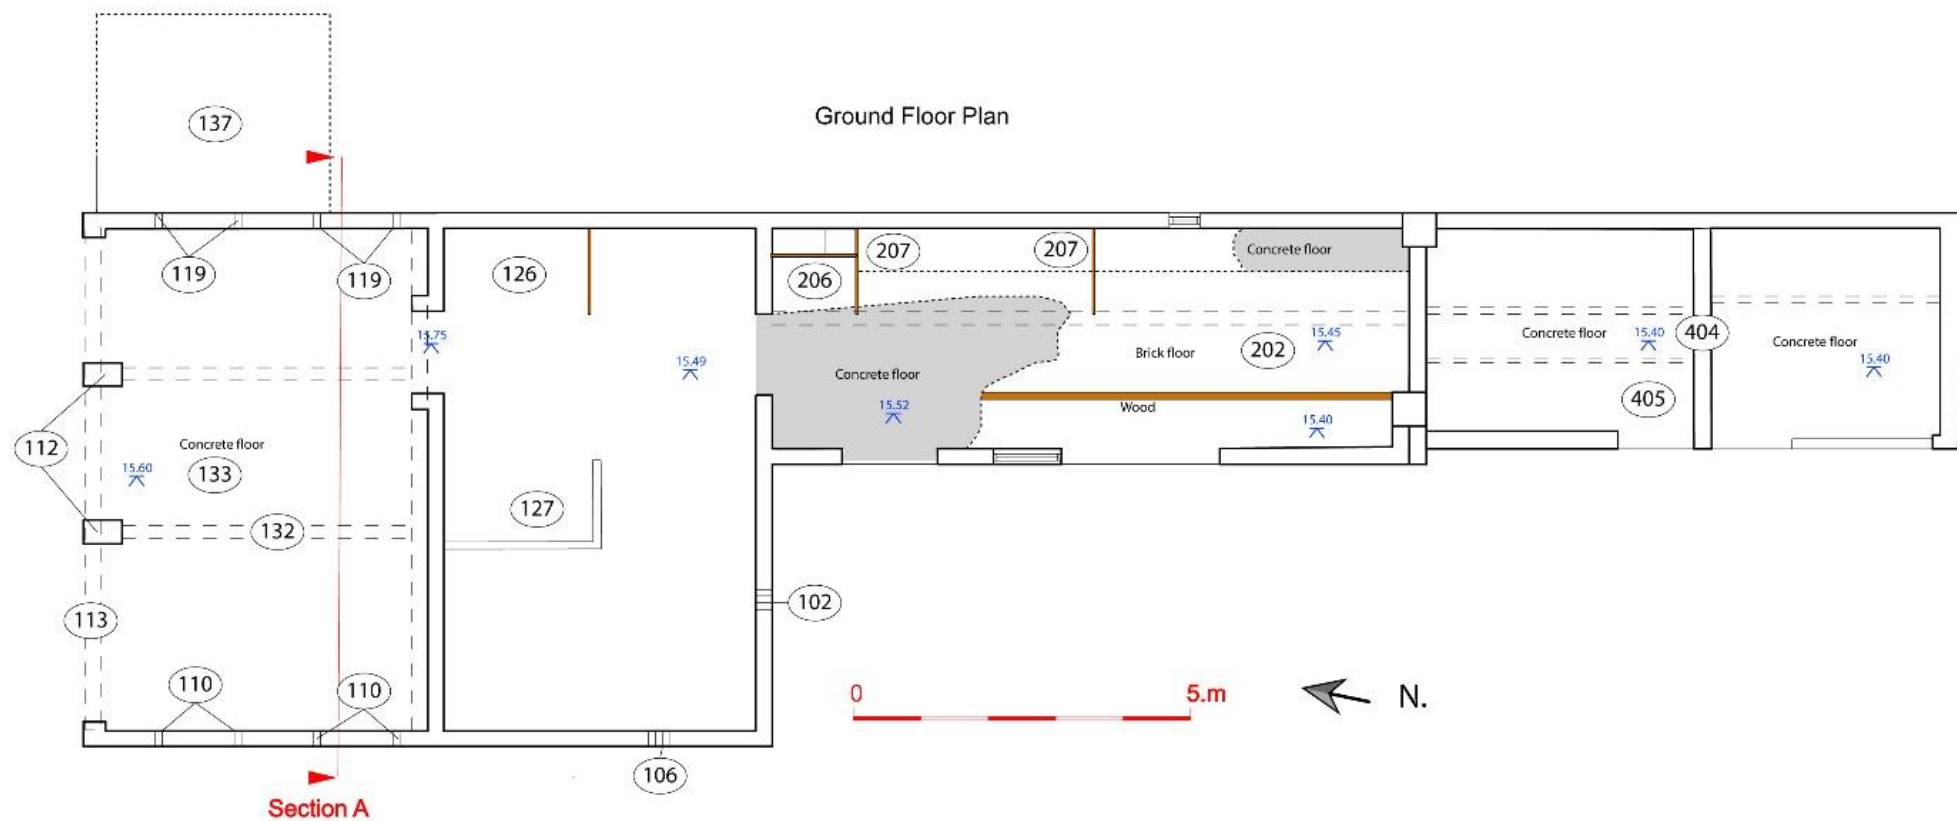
The ground floor plan of the Combination Barn, Multi Bay Shelter Shed and Loose Box.
